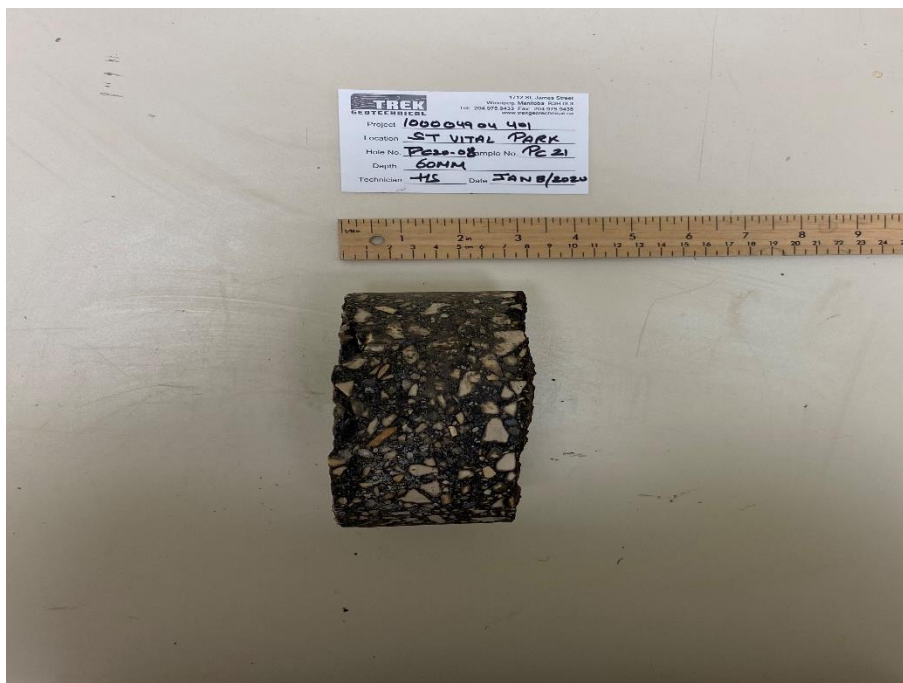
Pavement Core Sample at Pavement Hole PC20-08
